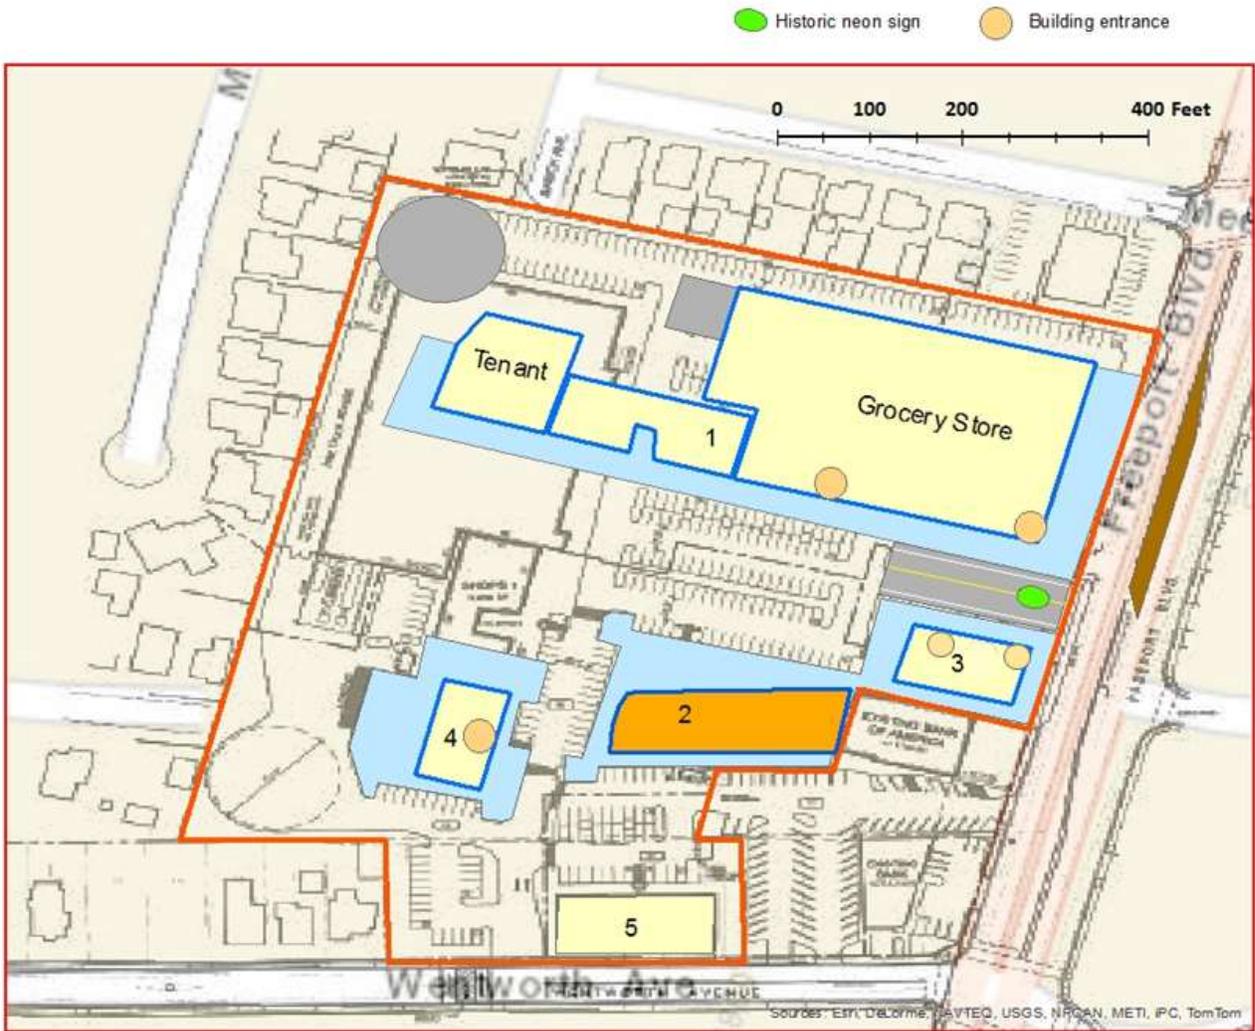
Alternative site layout of project buildings recommended by HPNA.
